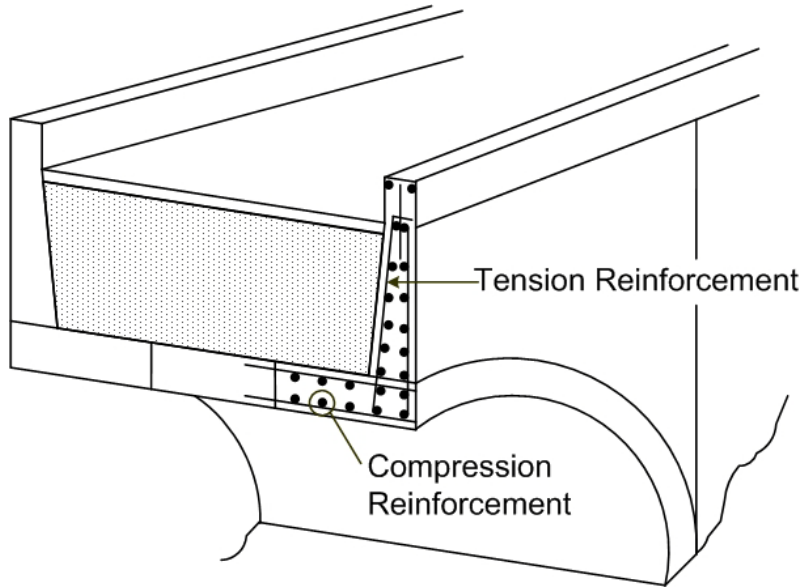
Reinforcement in a Closed Spandrel Arch
